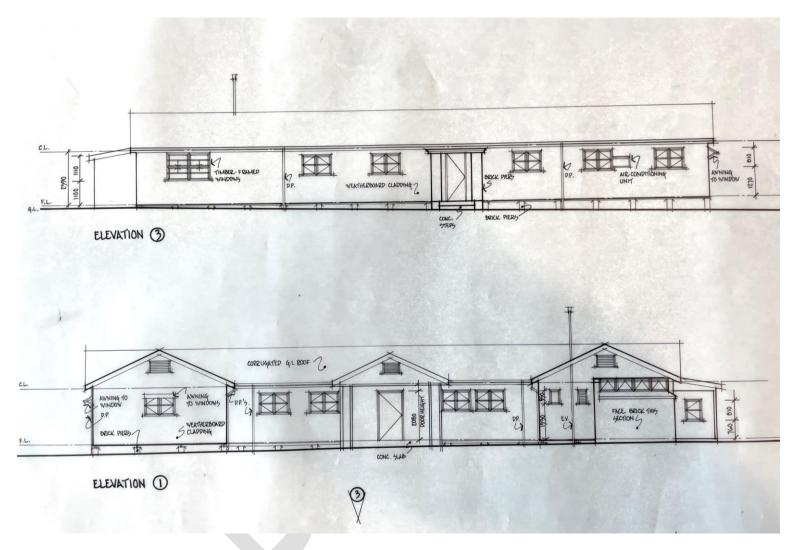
East (front) and west (rear) elevations of former RAAF Headquarters building (Source: provided by Aeria Management Group)
